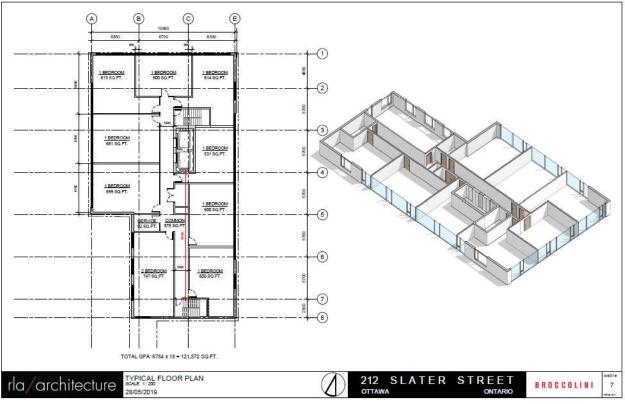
Typical floor plan layout. Source: RLA May 24 2019.
